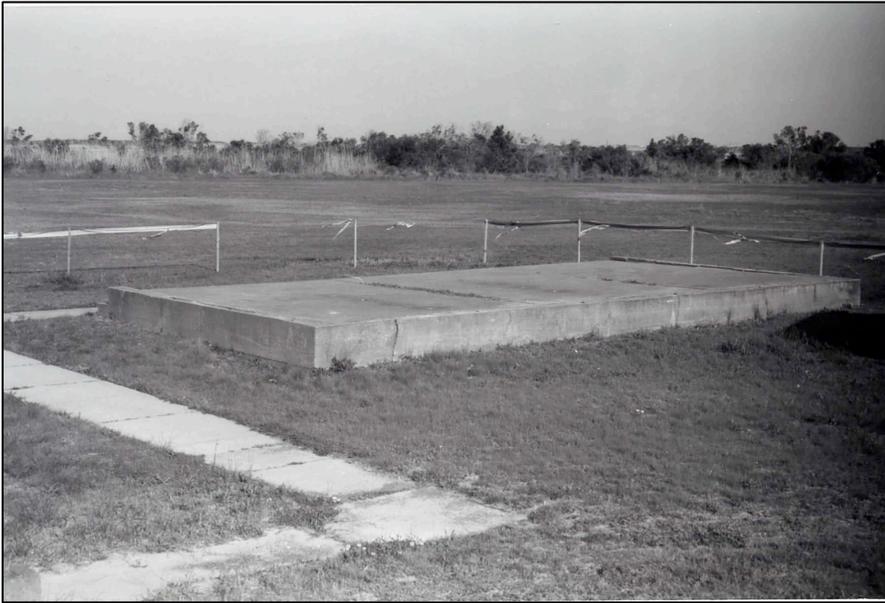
Woodshed foundation, 1990. (SERO Collection)
